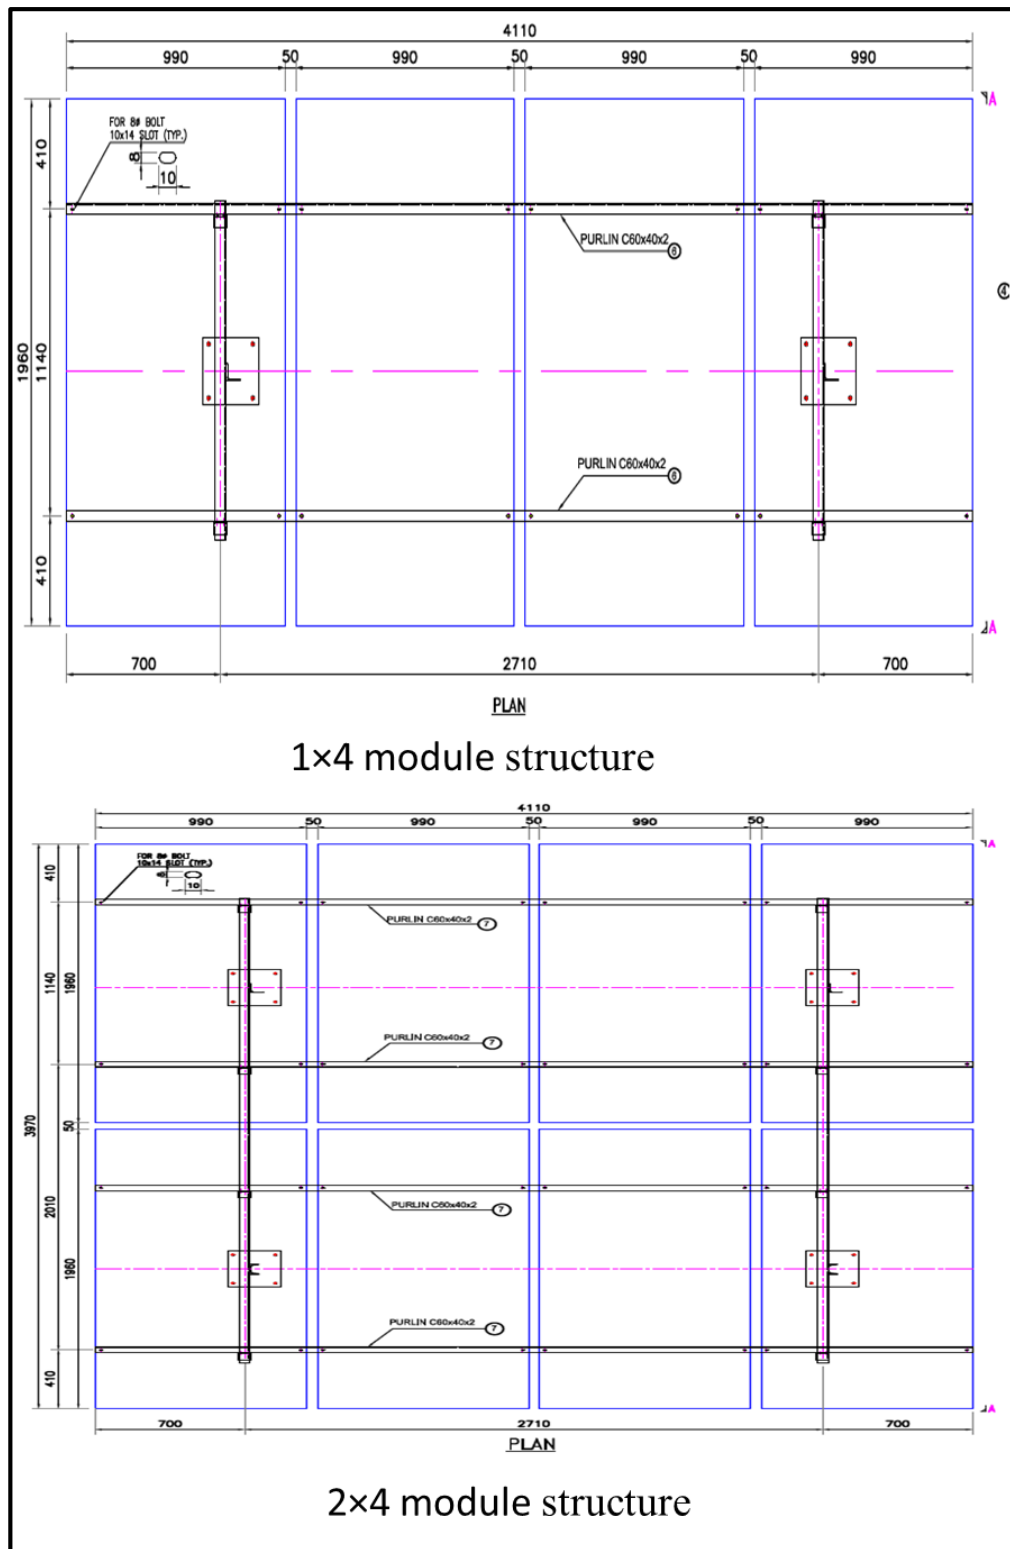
(a) and (b): Elevation view of 1x4 and 2x4 module mounting structure
